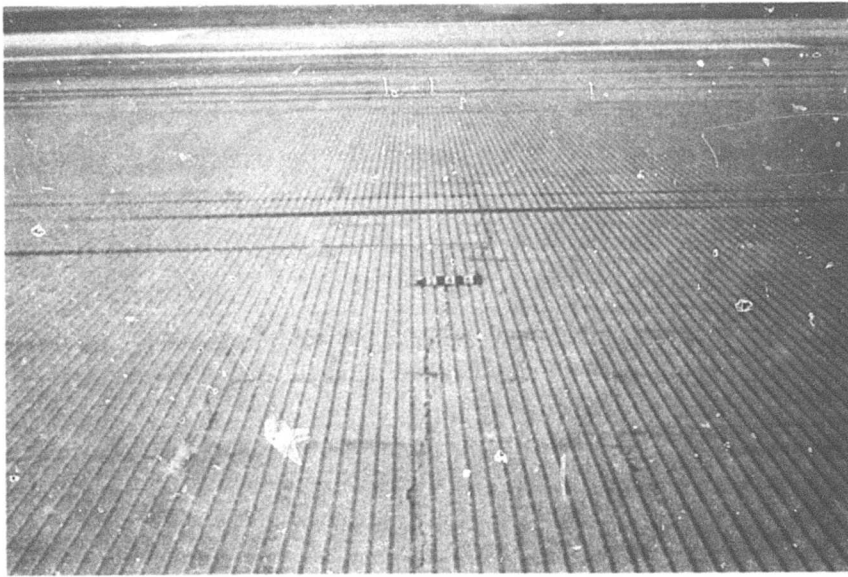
Chicago Midway Airport -- Typical transverse cracking found in continuously reinforced pavement.
